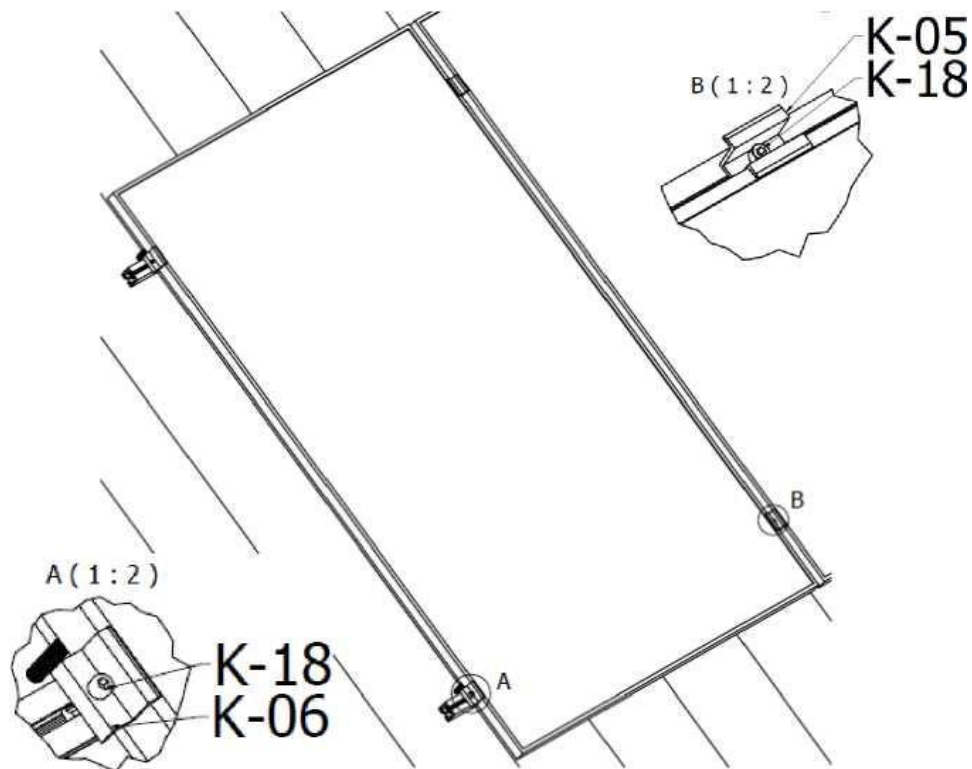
Mounting of the modules and mounting the K-05 and K-06 clamps
